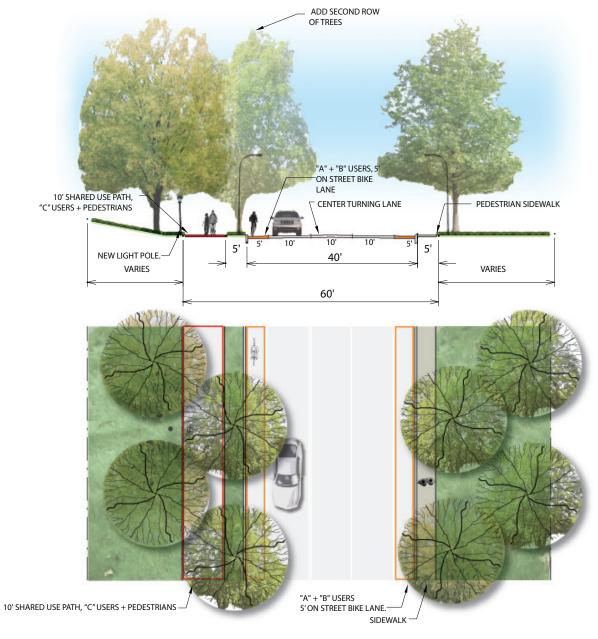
Eastern Parkway: Zone 7 Prototypical Section & Plan
